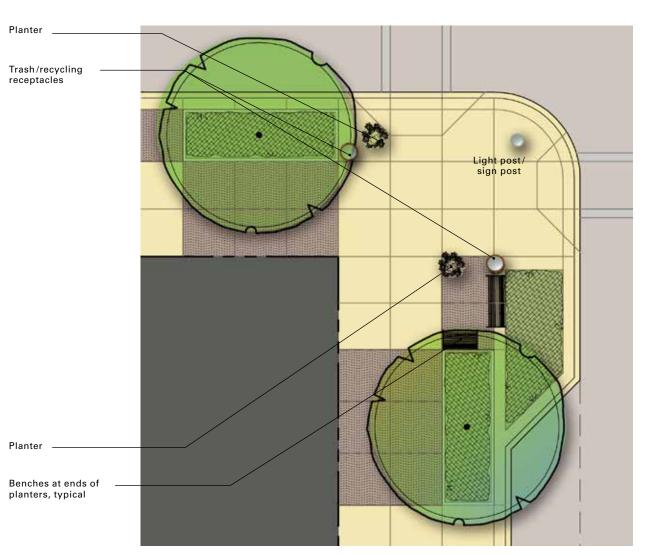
Example of street furniture configuration at an intersection showing benches and planters creating a small "garden room" and planters and trash/recycling containers along pedestrian paths.
